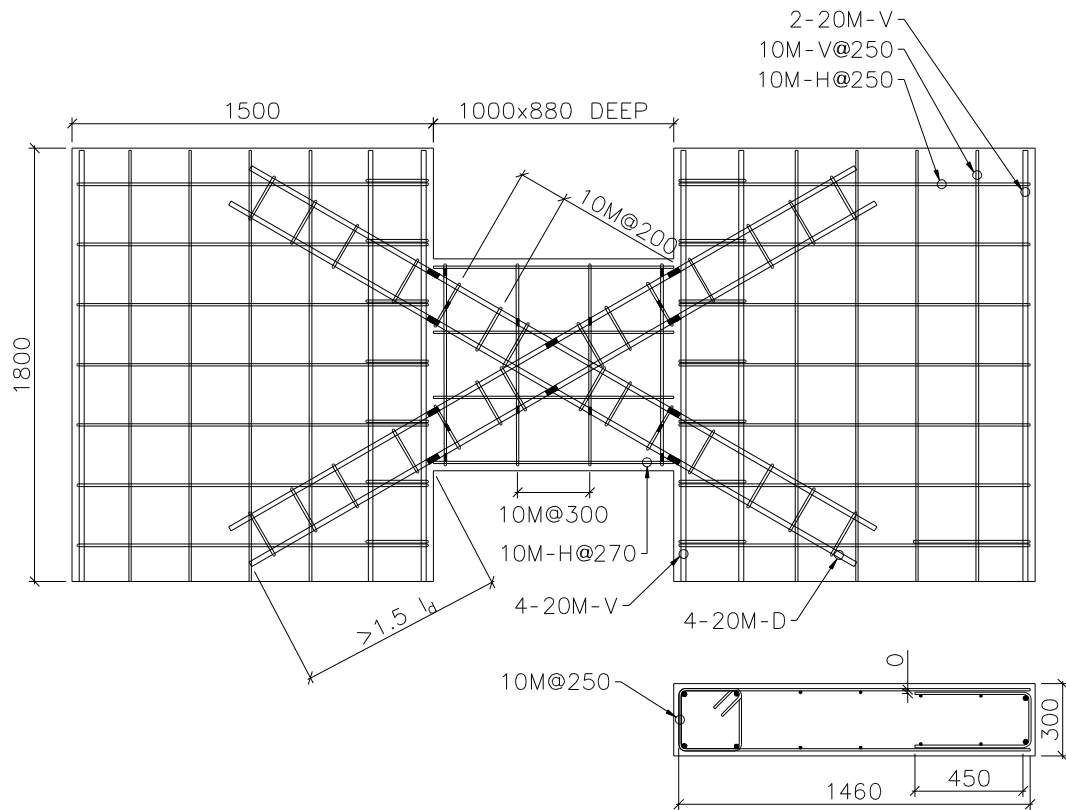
Detailing of specimen MD-10d<sub>b</sub>
